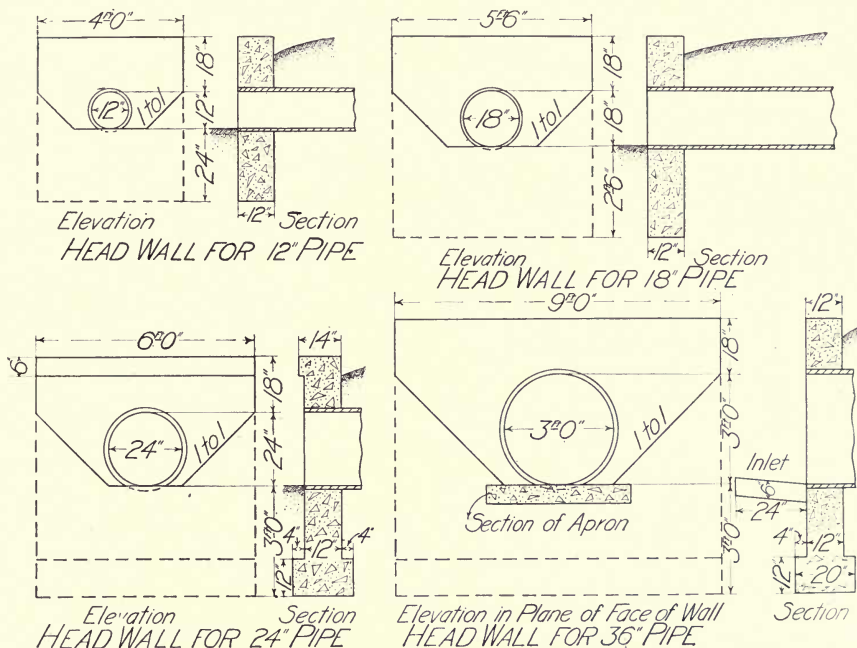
CONCRETE HEAD WALLS FOR METAL CULVERTS.
